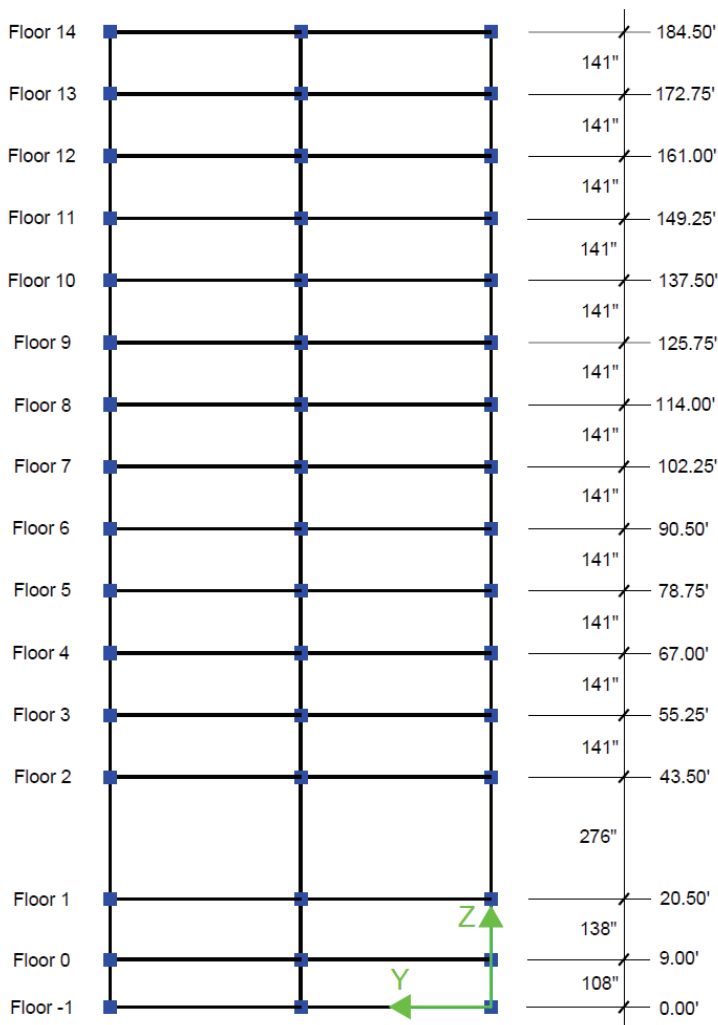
Transverse elevation (Y-direction) of the full-building model of the Sherman Oaks building.
